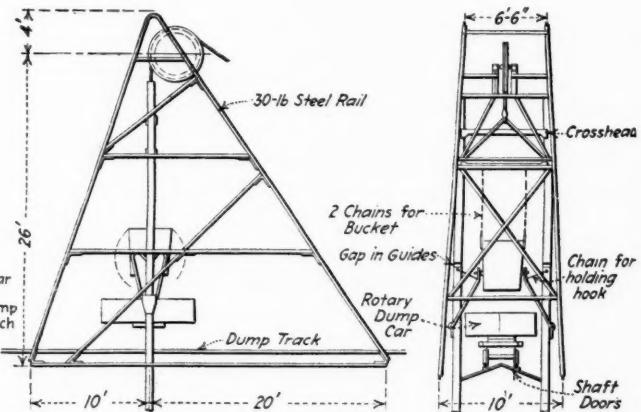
ARRANGEMENT OF HEADFRAME, HOISTING BUCKET AND DUMP TRACK
